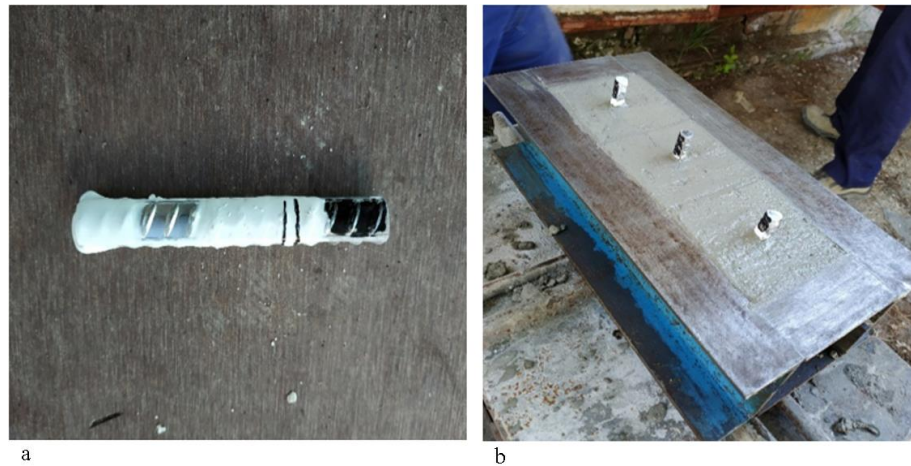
a) Coated and marked tested rebar; b) Tested rebars embedded in wet concrete inside the moulds.
